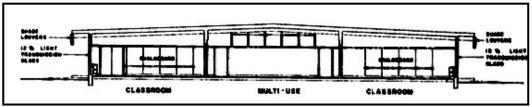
Section, Van Duzen Elementary School, open-plan school with cluster-plan configuration. Source: Gibson, 1965.
